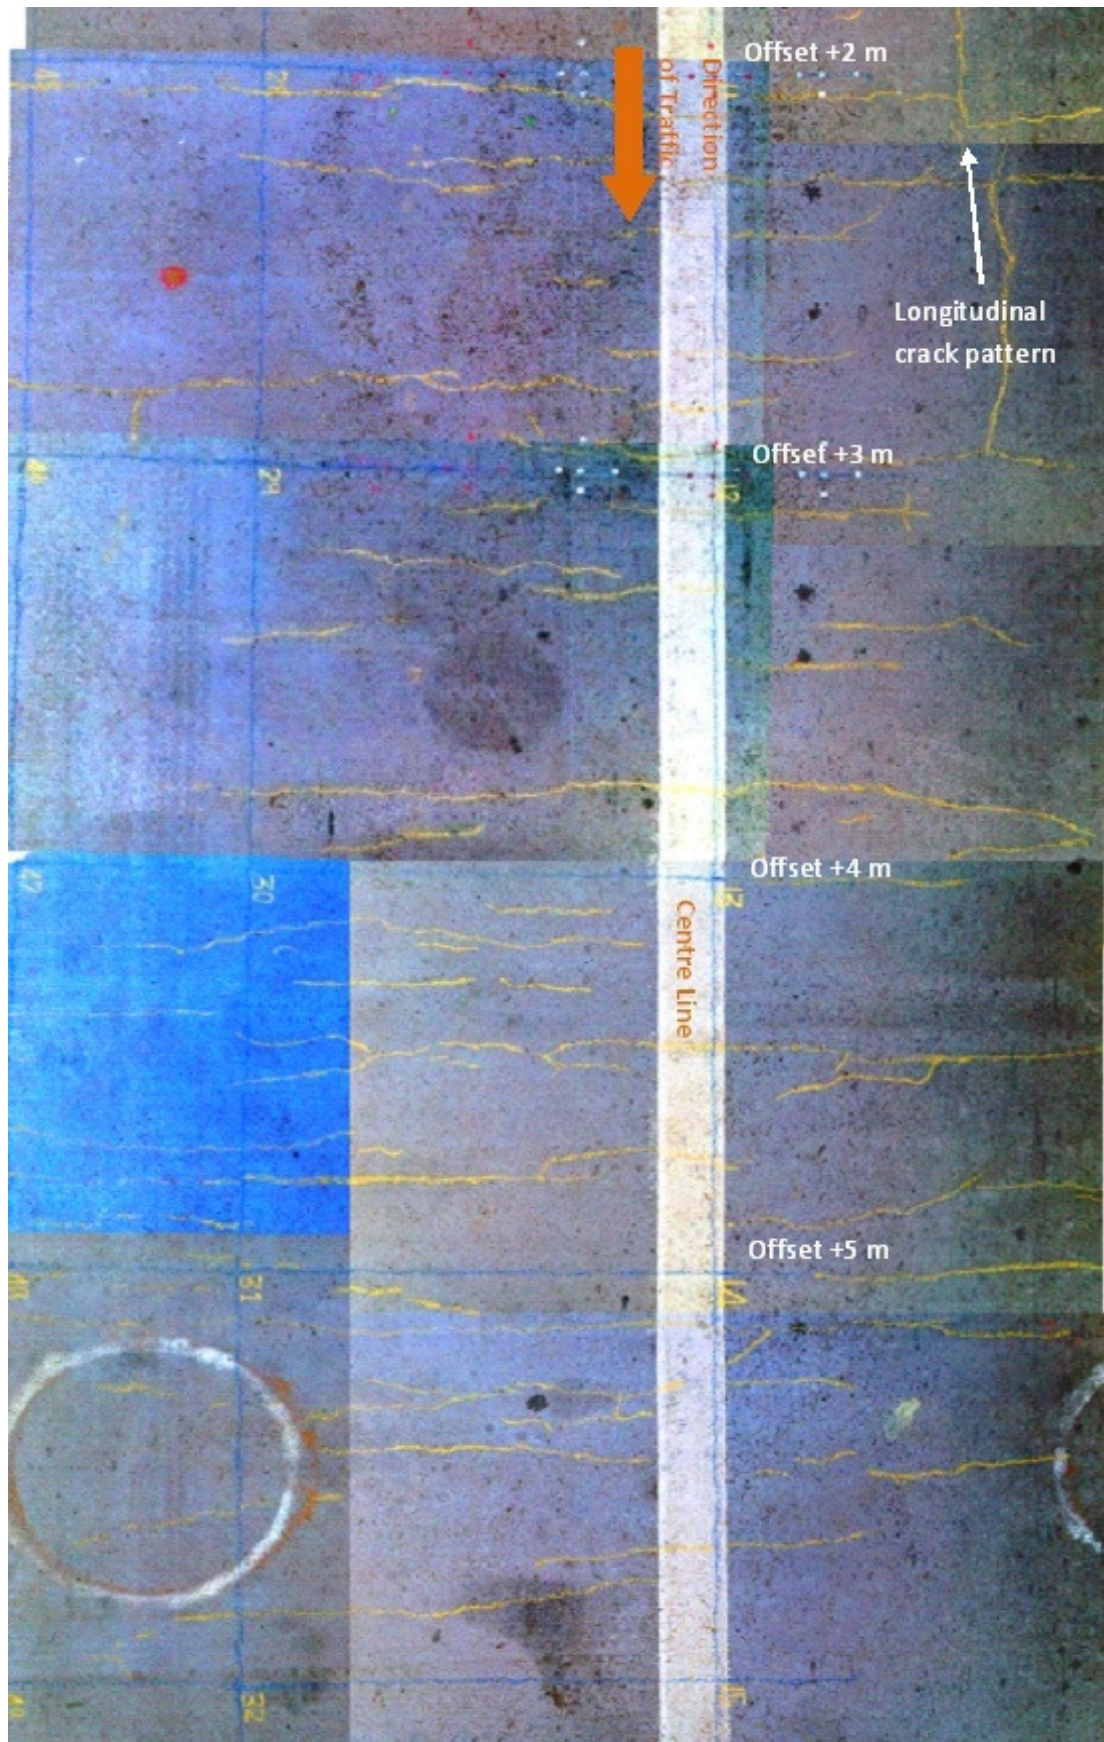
Pictorial view of cracks on test section at longitudinal offsets -2 m to +5 m at 2.8 million load applications
